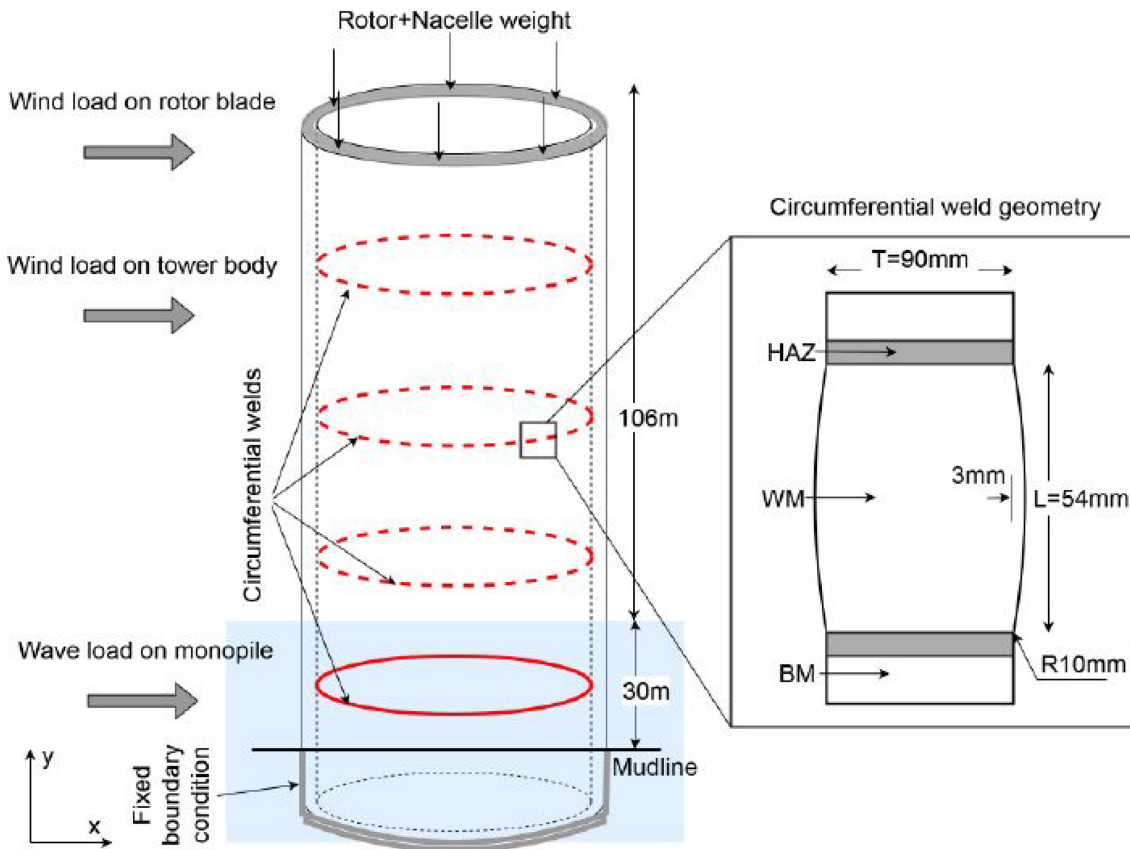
Schematic of the model geometry and loading conditions. The weld geometry is shown in the enlarged view on the right. Only the bottom weld (shown in solid red line) was included in the model. (Note: Figure is not to scale. HAZ: heat affected zone, WM: weld metal, BM: base metal) [Colour figure can be viewed at wileyonlinelibrary.com]
